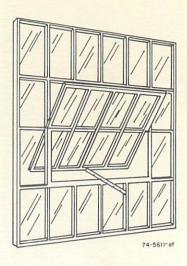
Fenestra Type Windows with Movable Center Section - Plain Glass Foiled.
